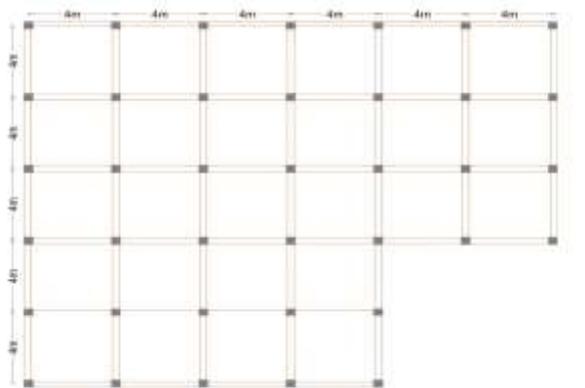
Plan of three, seven, and twenty two-storey irregular RC buildings (all dimensions are in m)
